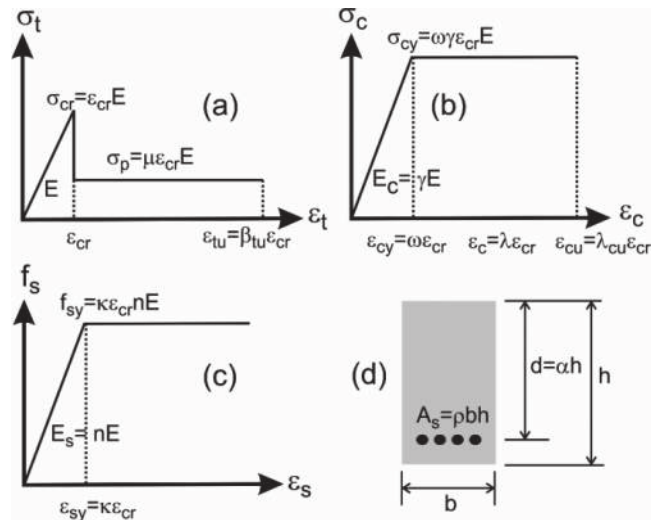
Material model for singly reinforced concrete design: (a) tension model; (b) compression model; (c) steel model; and (d) beam cross section.
